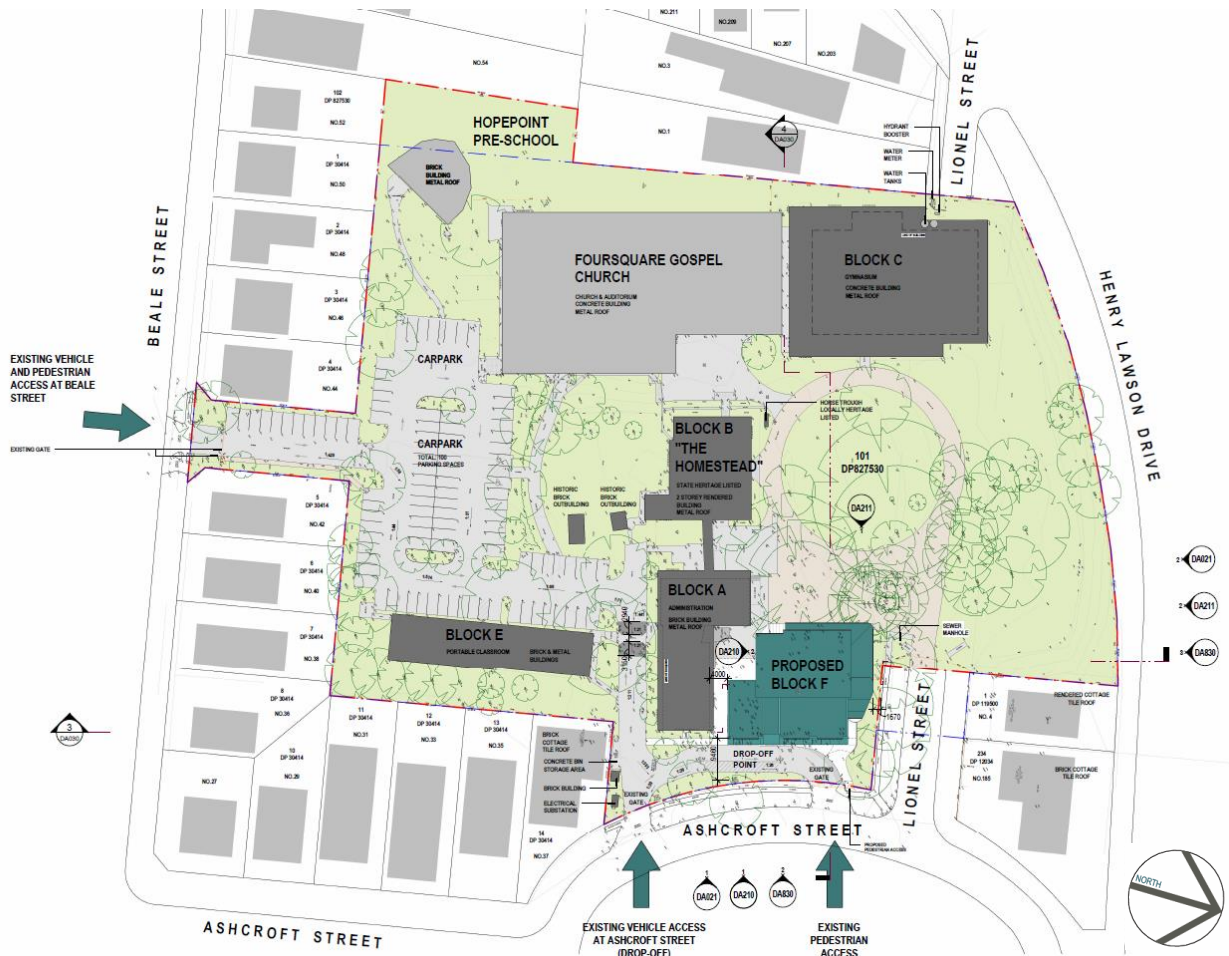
Proposed Site Plan (Source: Leaf Architecture)
